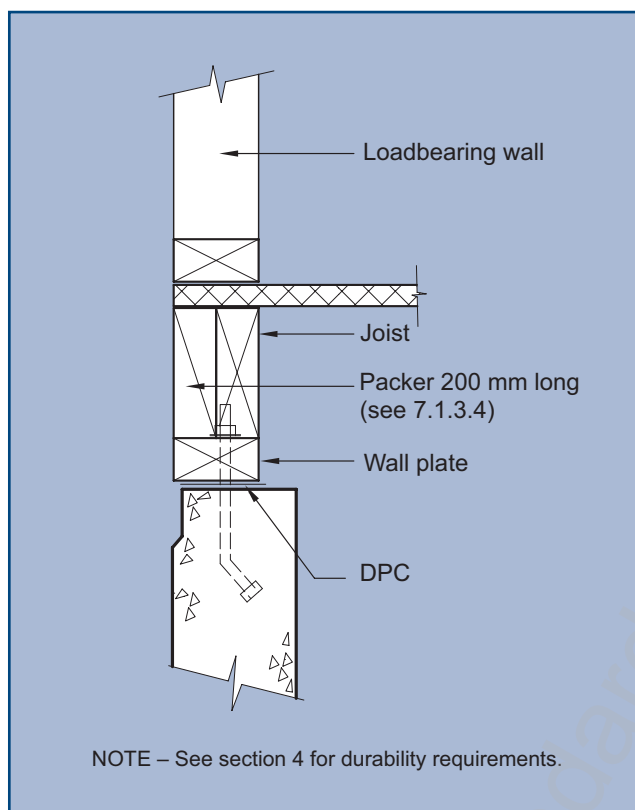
Loadbearing wall over foundation (see 7.1.3.4)
